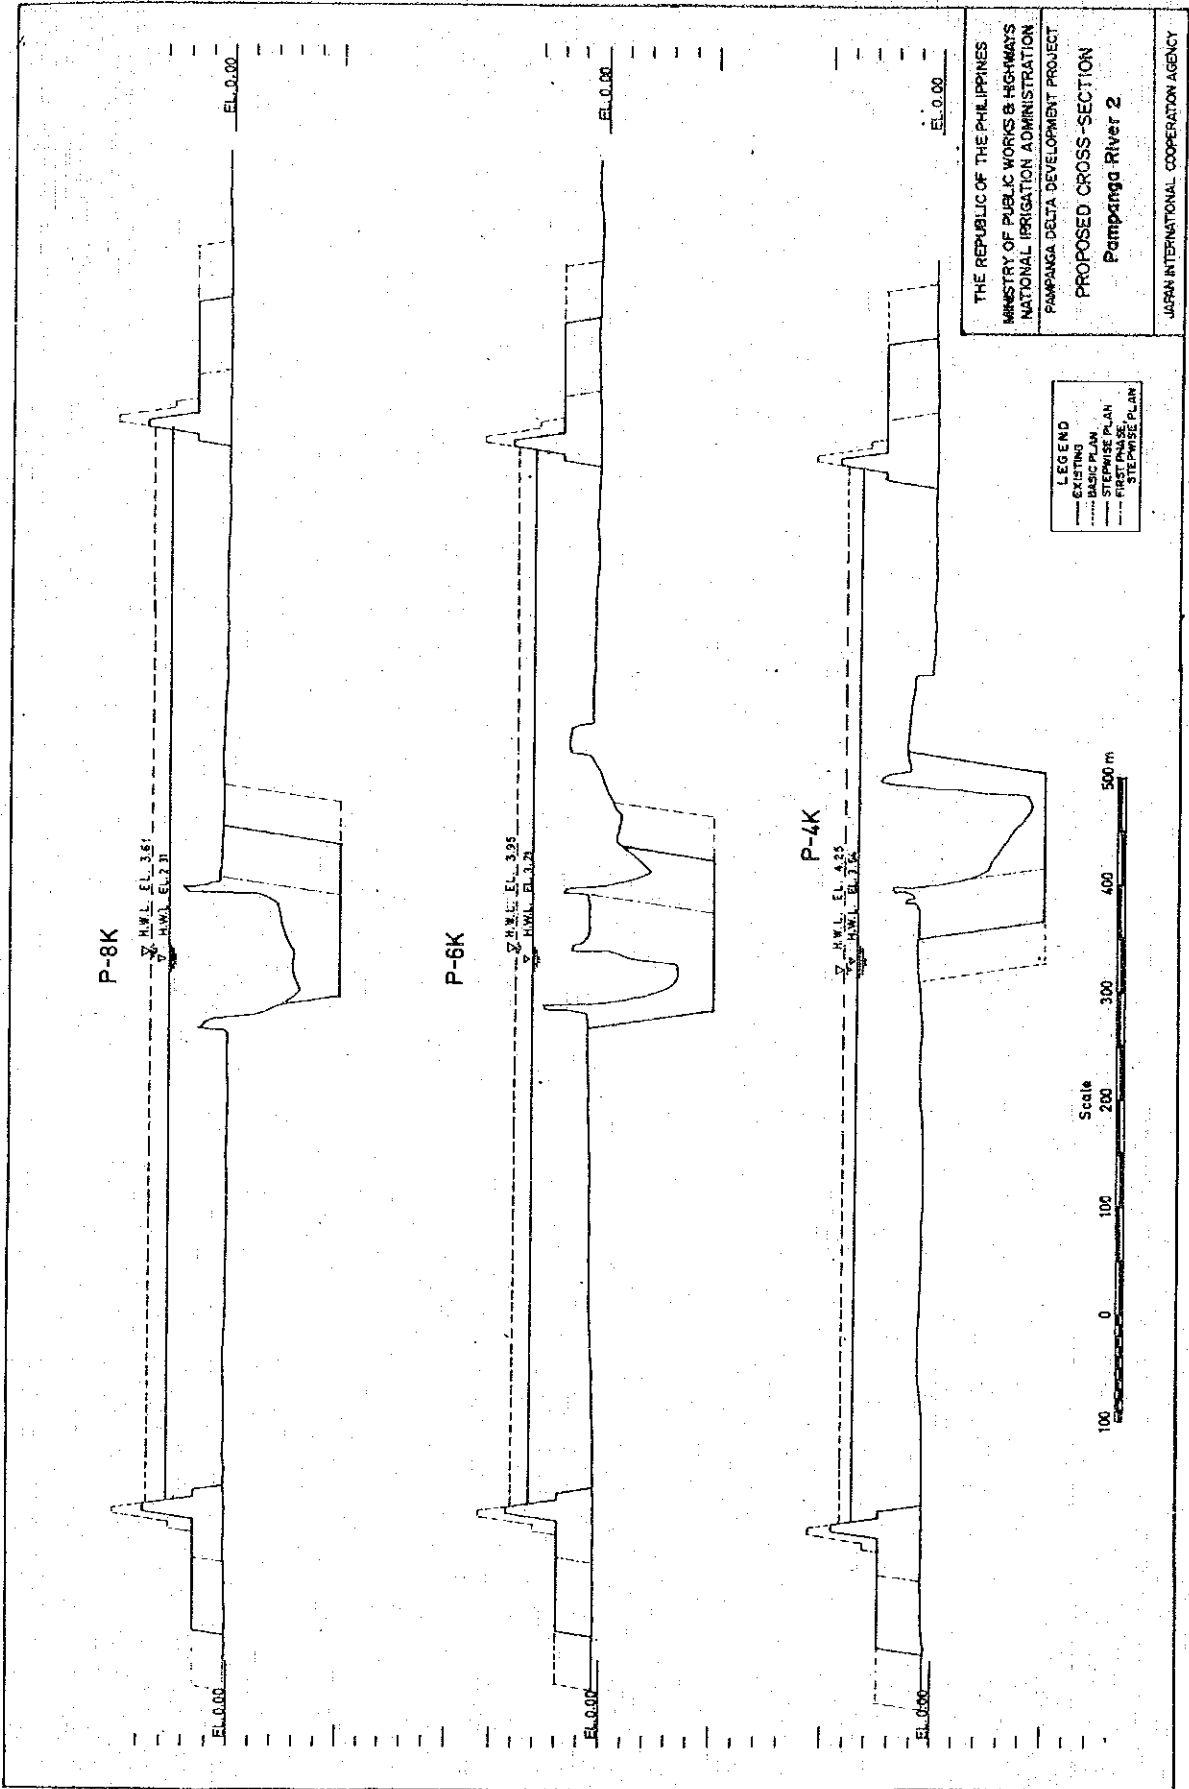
(3) PROPOSED CHANNEL CROSS-SECTION
